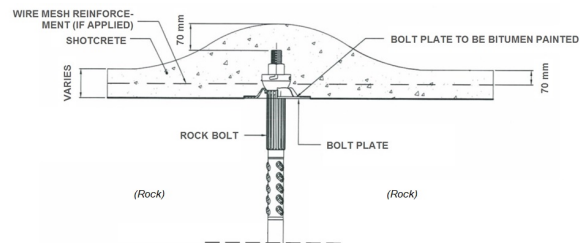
Schematic illustration of shotcrete fire protection cover to rock bolt head.
